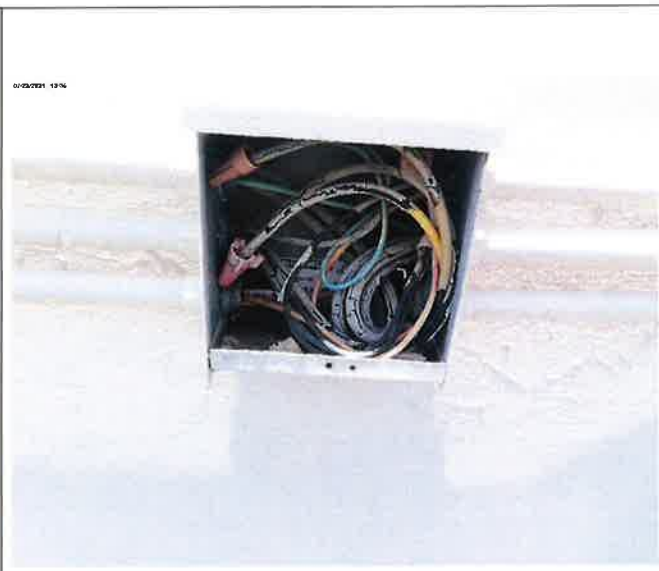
Opening in junction boxes/enclosures (Item #10.f.1)
